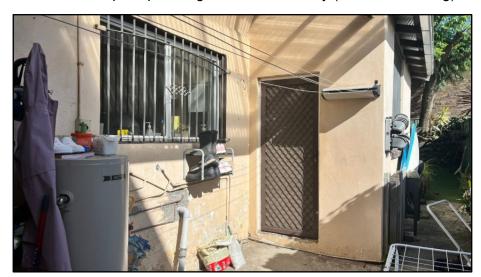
View of eastern side elevation kitchen window at 8 Lynch Avenue (provided by Occupant submission)
